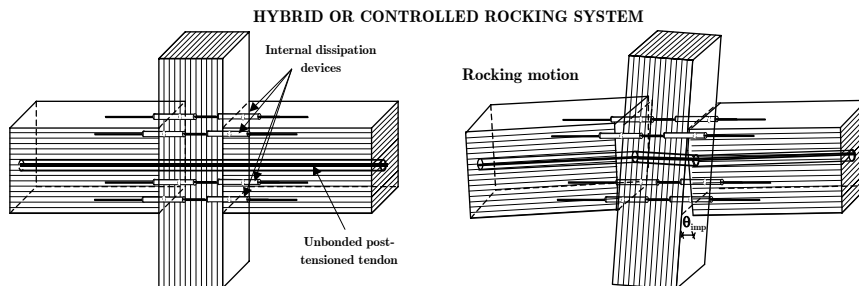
Basic concept of hybrid jointed ductile connections for LVL frame systems.
